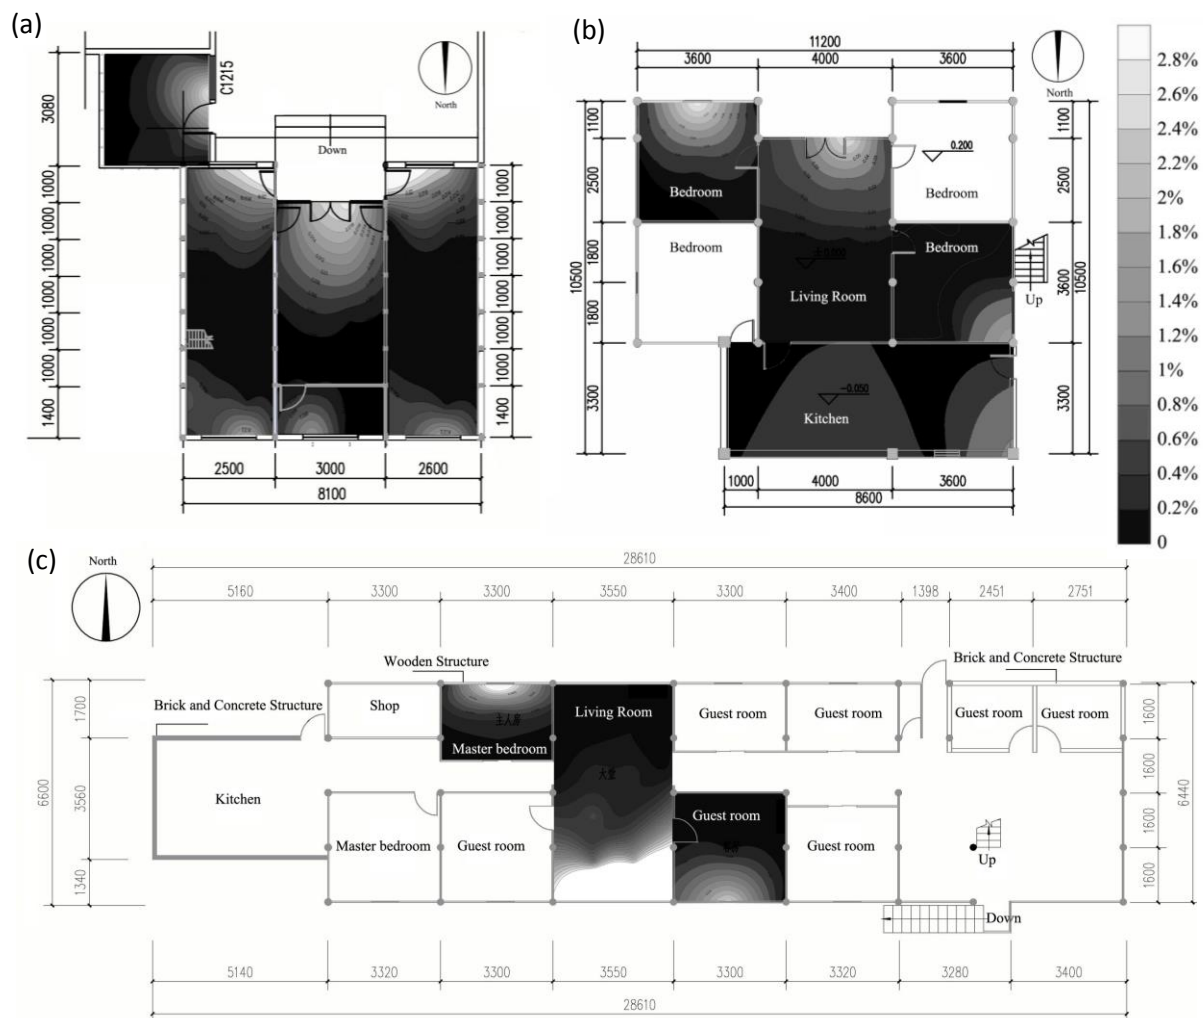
Floor plans and DF isolux contours of rooms tested in Jiangchang dwelling ground floor (a), SanBao Dong dwelling ground floor (b) and Xijiang Miao dwelling first floor (c)
